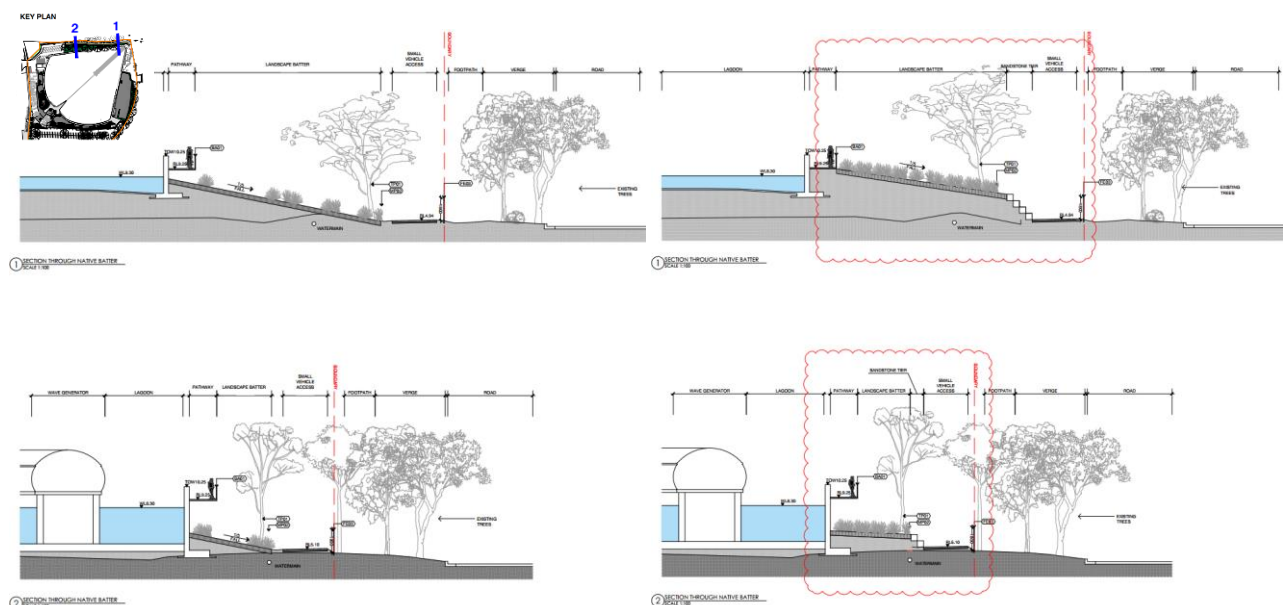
Comparison of the landscaped batter adjoining Hill Road as approved and as proposed to be modified.
